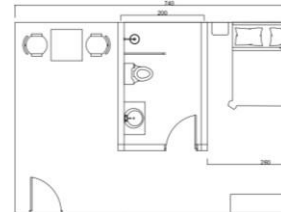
Layout sketch of double bed (Azkia, 2023)
